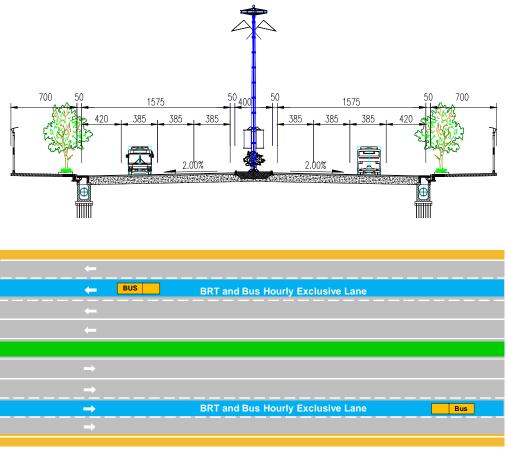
Plan and Cross Section of Two-way Service Road at Western Side
